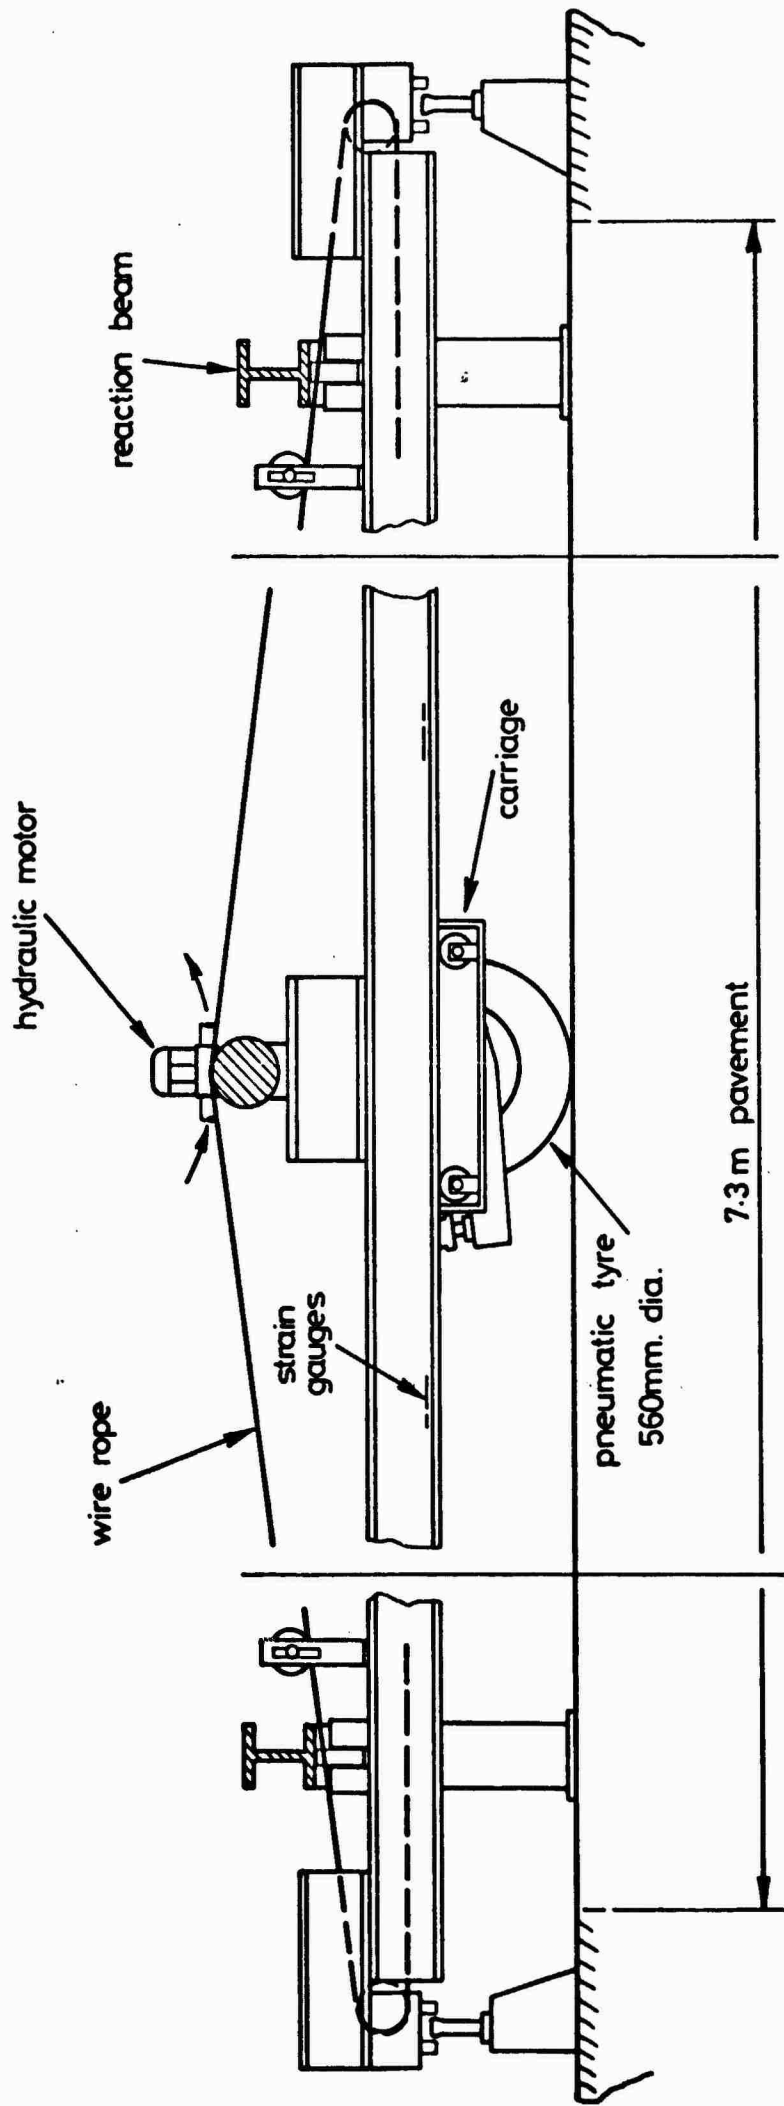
SIDE VIEW OF PAVEMENT TESTING FACILITY
